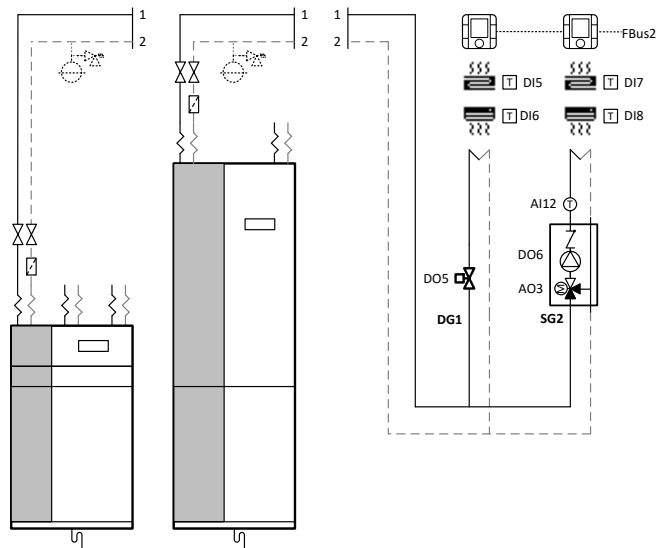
Dual zone wiring scheme directly to the heating / cooling system
